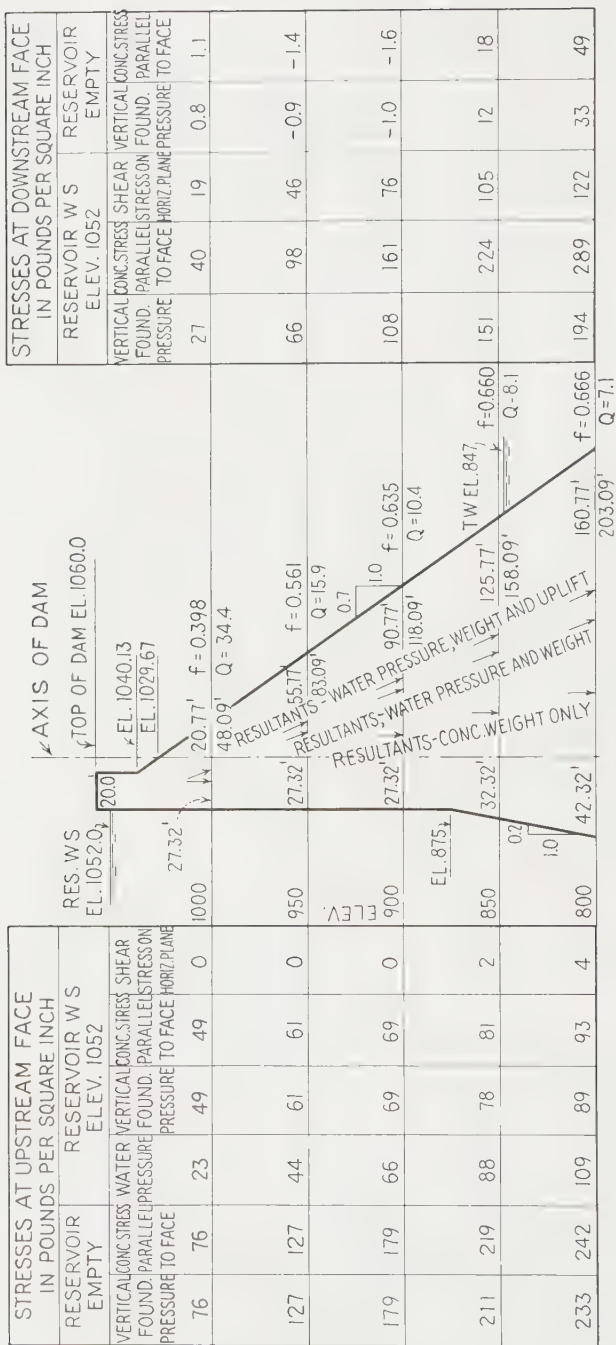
Structural analysis, bulkhead section, Norris Dam.
